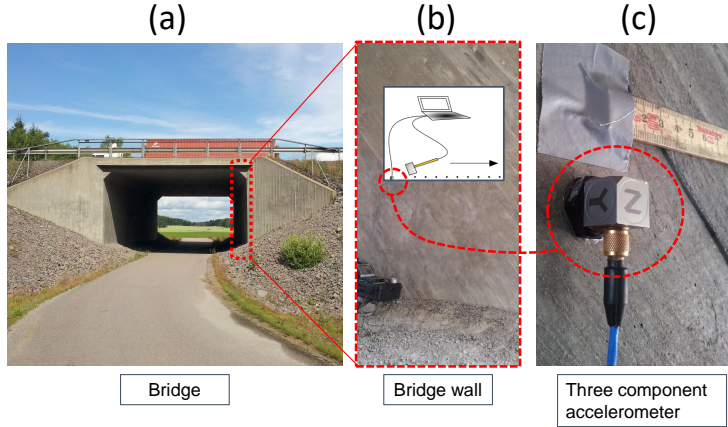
Photographs from a practical test of polarization approach. (a) Bridge test object. (b) Bridge wall. (c) Expanded view of accelerometer mounted on the bridge wall.
